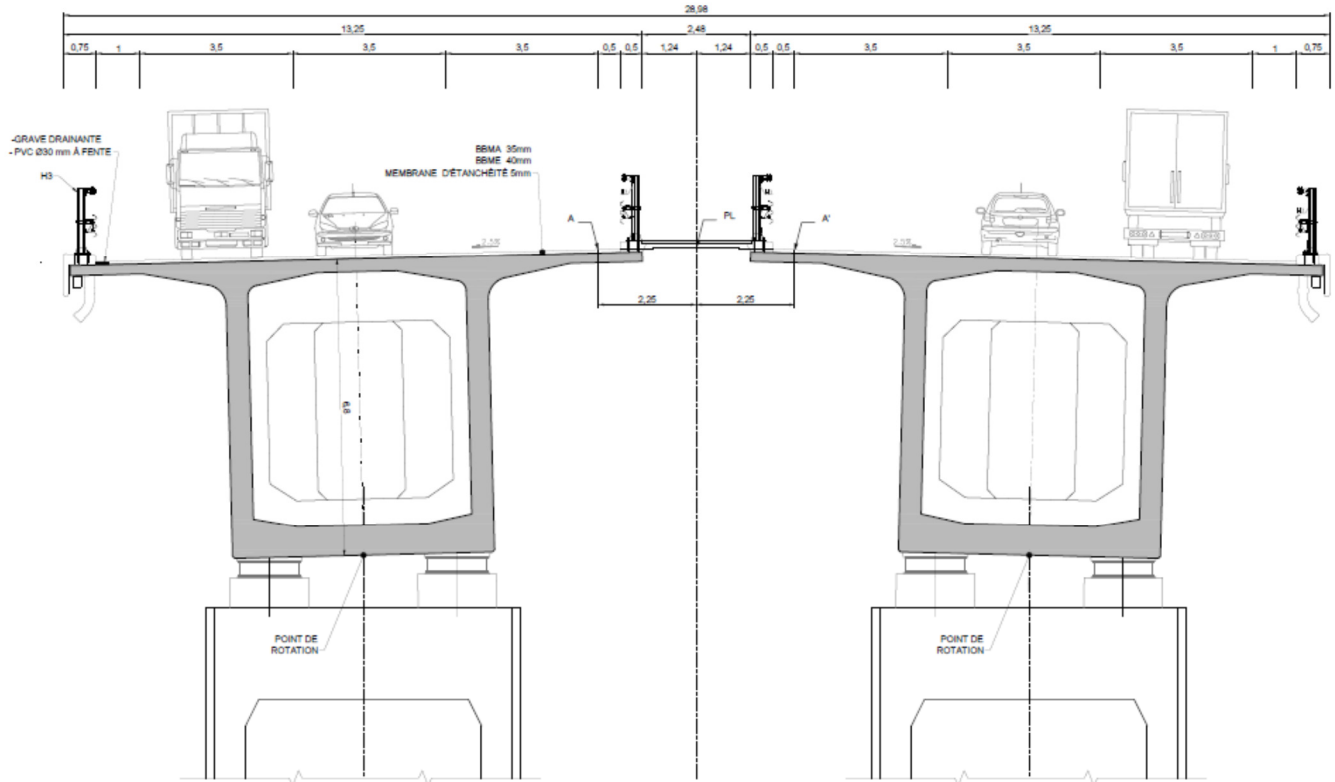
Cross section of Tabellout Viaduct / Sezione trasversale del viadotto di Tabellout
